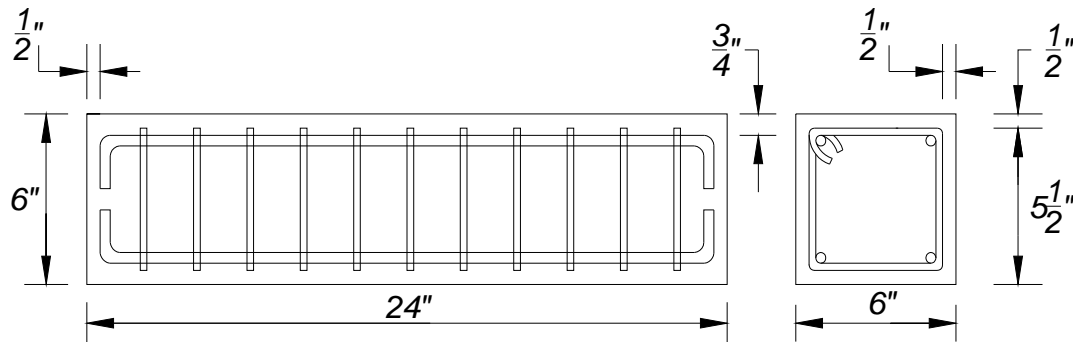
Reinforced beam design with #3 rebar and 0.25-in. ties.
